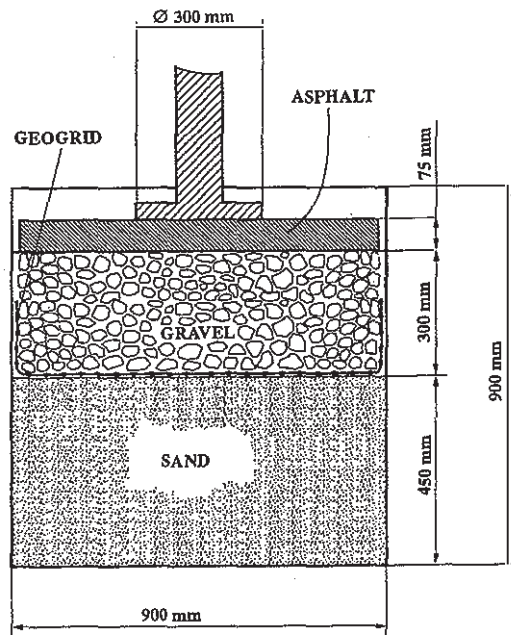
Typical cross section of the testing apparatus showing the inner dimensions, the loading piston and the geogrid location.
